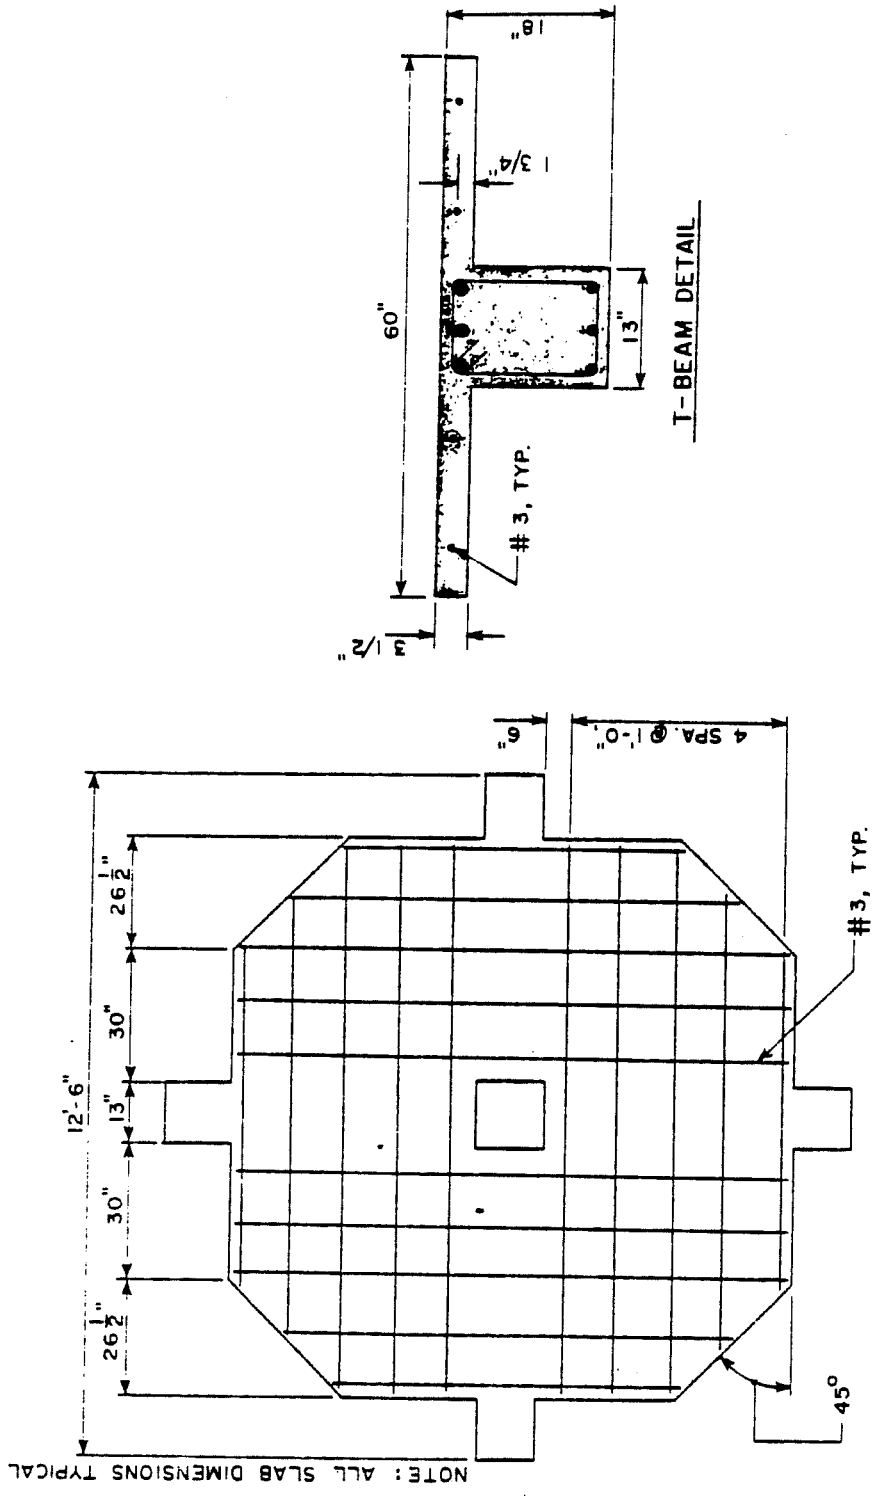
BCJ9 - Specimen with a slab - Slab details
